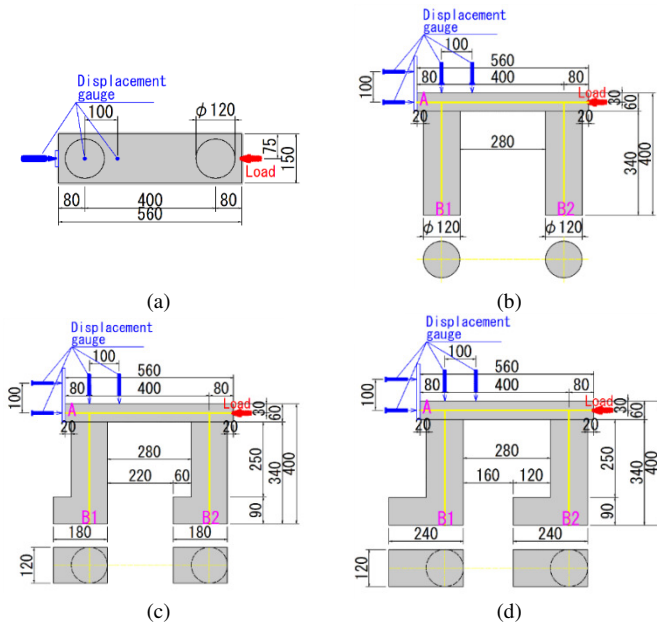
Model specifications (unit: mm): (a) plan view, (b) side view: normal, (c) side view: widened 1, and (d) side view: widened 2.
